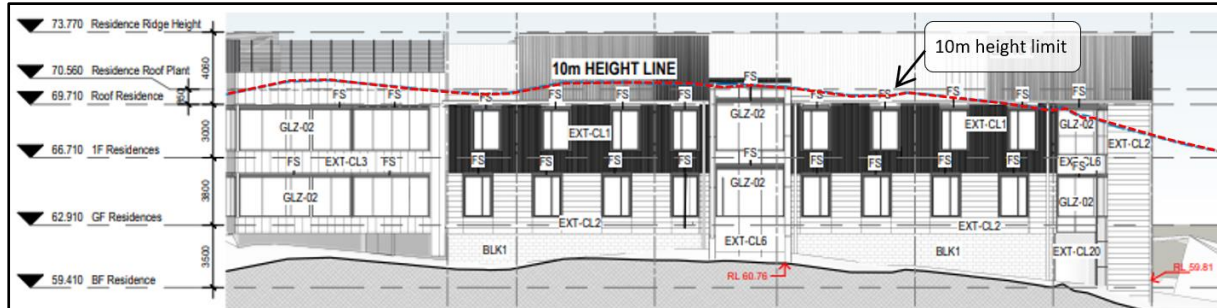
| Residential Pavilion 4 south elevation (Source: Applicant's SRtS)
